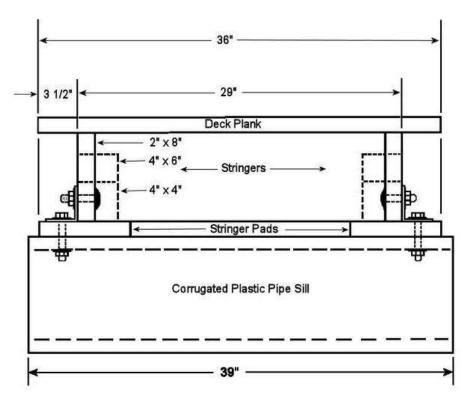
Corrugated Plastic Pipe Sill Assembly Detail
